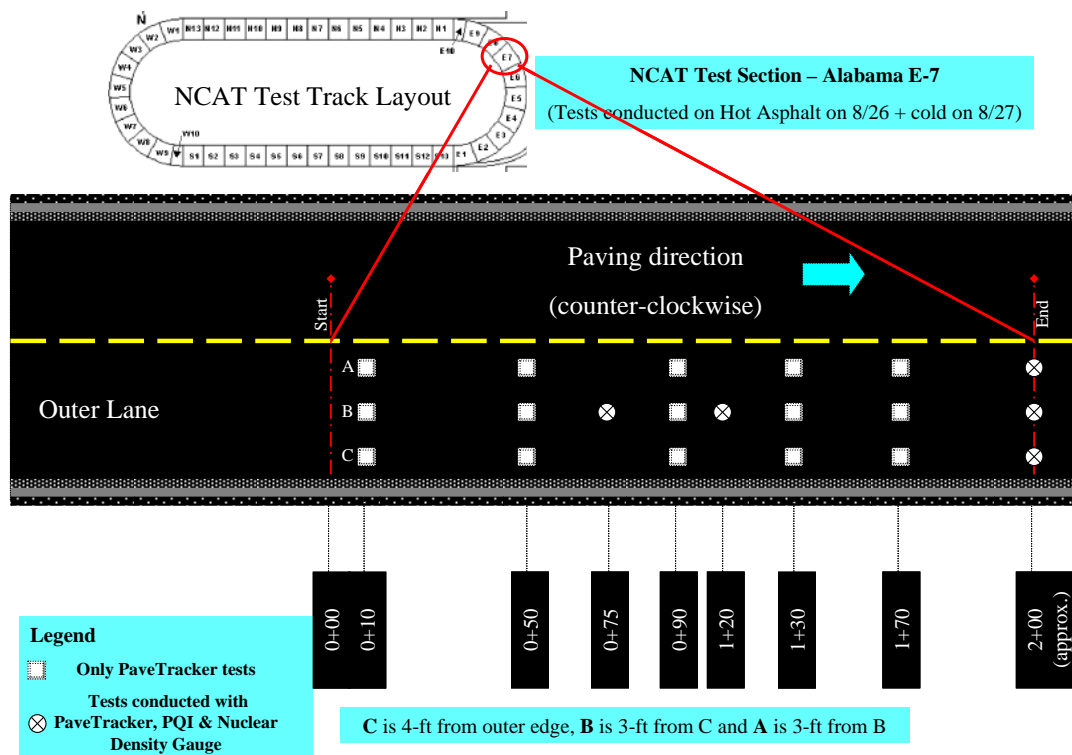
Test Point Layout Along the Alabama E-7 Test Section at NCAT (refer to Tables B.14 and B.15)
